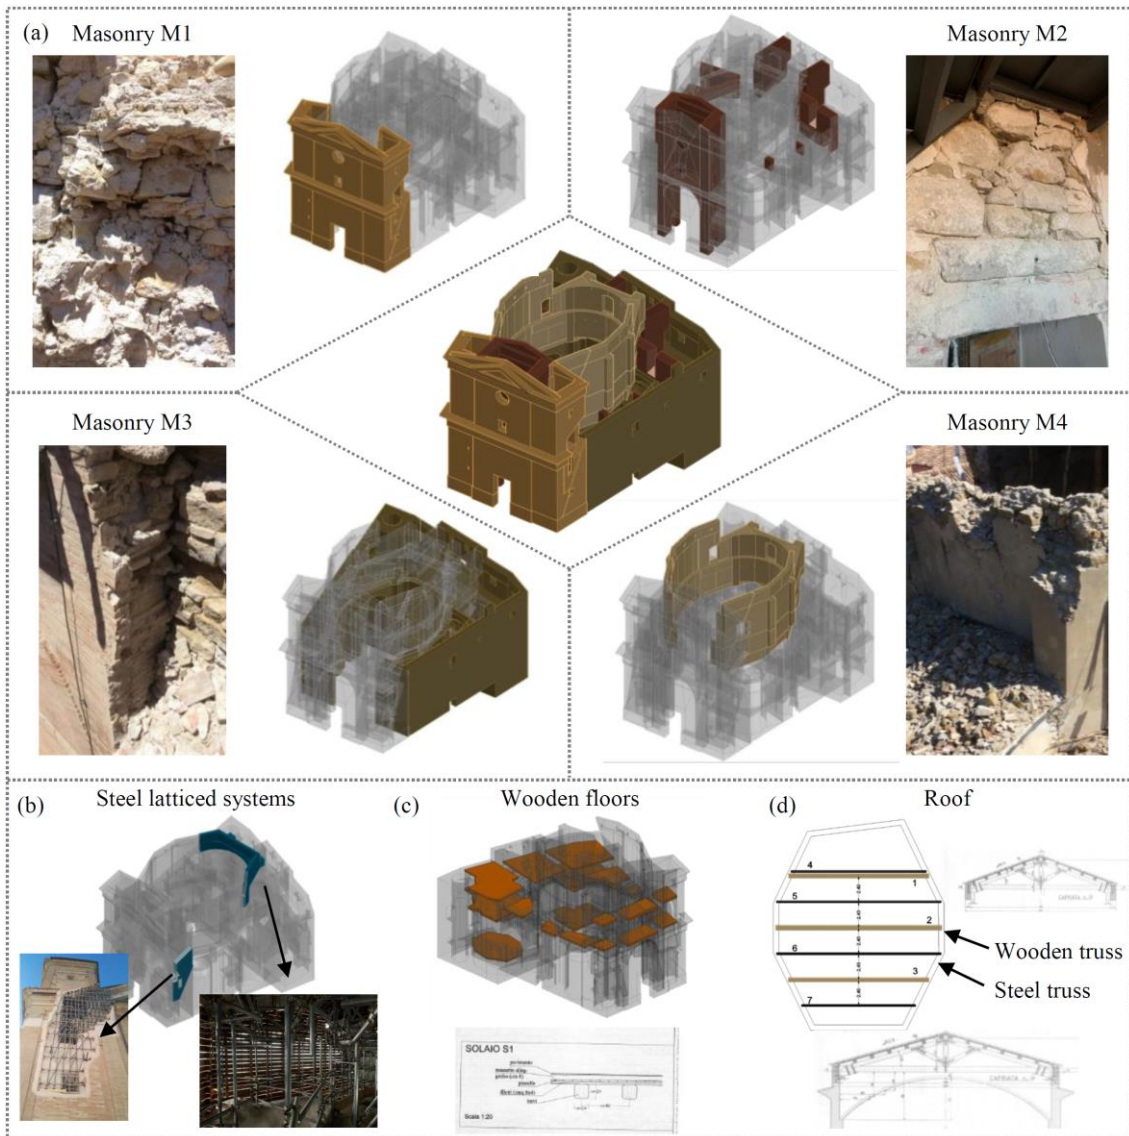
Materials and structural information from in-situ surveys: (a) masonry typologies, (b) steel lattice systems to restore the gravity load paths, (c) interior wooden floors, (d) roof details.
